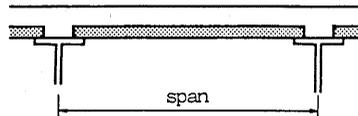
Span length of prestressed concrete panel composite slab
